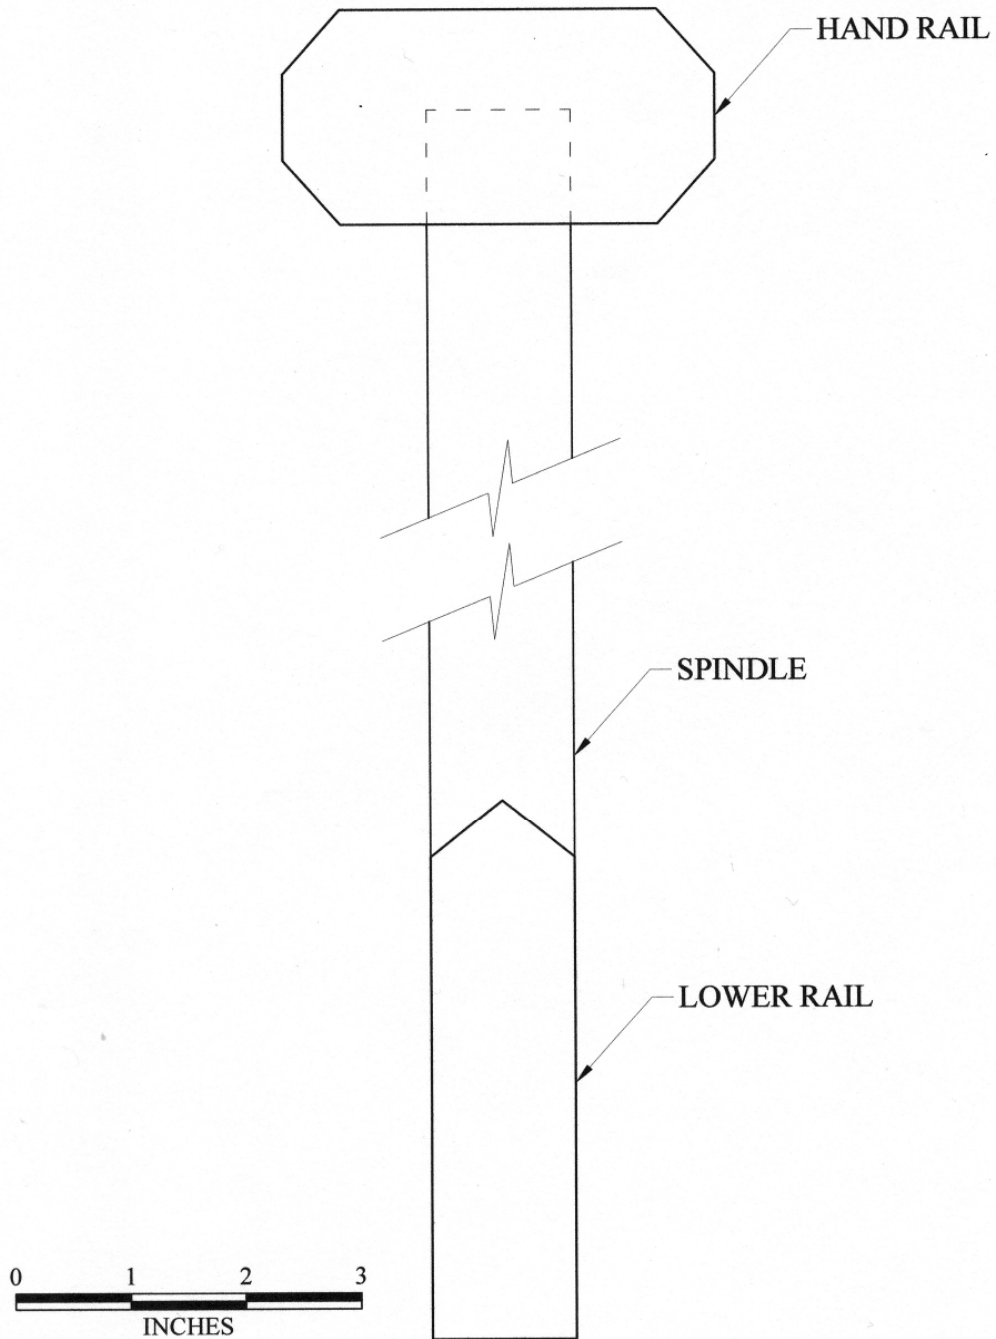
Sectional through the railing used on the upper deck of the rear porch on the Moore House. The spindles were rectangular (5/8"x1-1/4") and were mortised into the handrail and toe-nailed into the lower rail.
